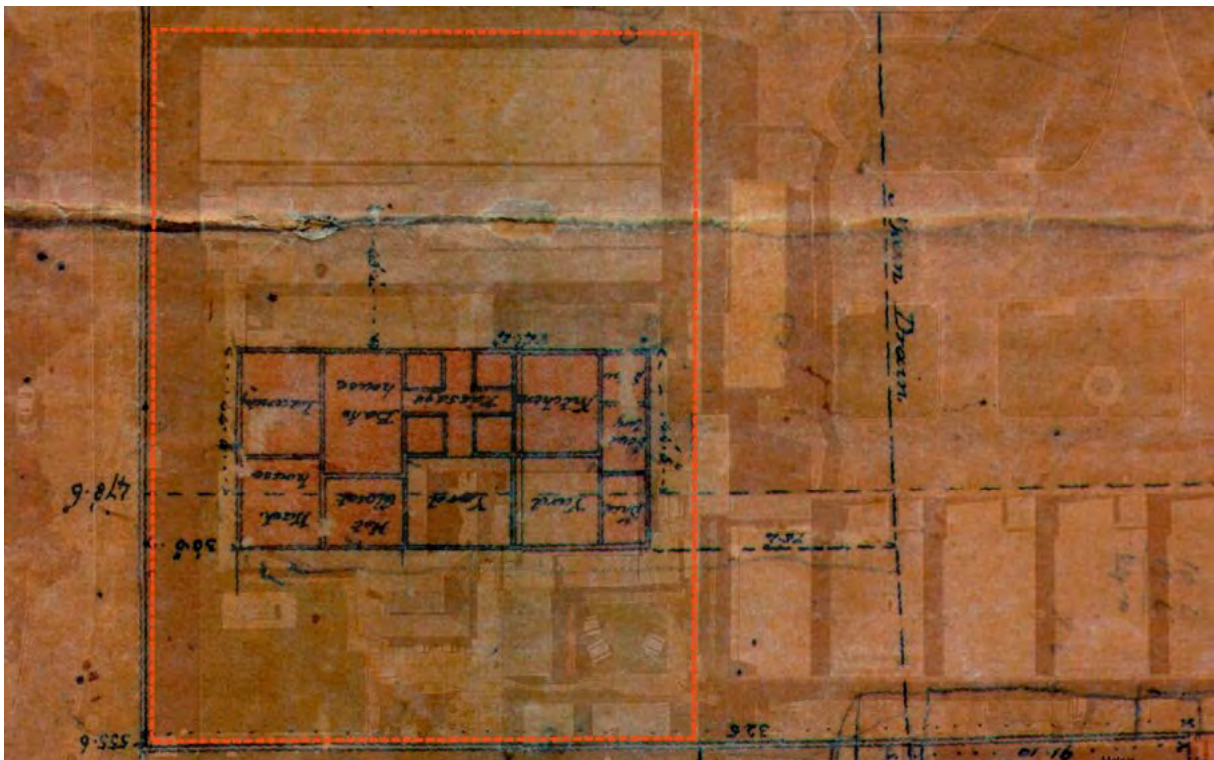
The 1858 plan of the gaol shows a similar site plan to that recorded in 1856, with the exception of some minor changes to the western walls. This plan also shows the convict era plumbing of the zone. No well is recorded in this plan and it may never have been constructed.
